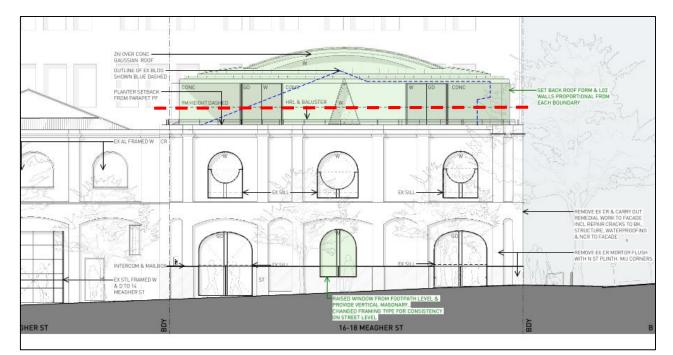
Southern elevation showing the 9m height control and existing roof form dashed
